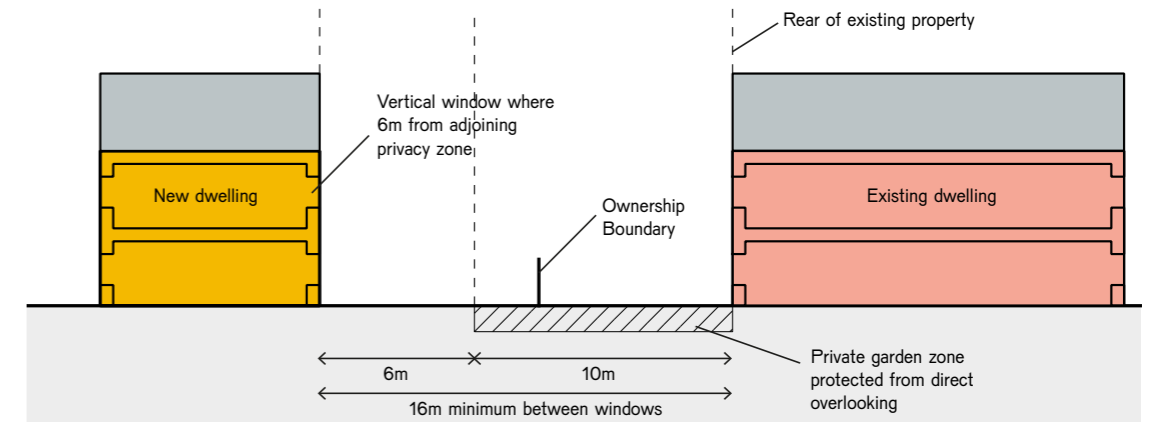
Where existing gardens are less than 10m deep, new conventional windows serving habitable rooms must still maintain a minimum 6m distance from the private garden zone
